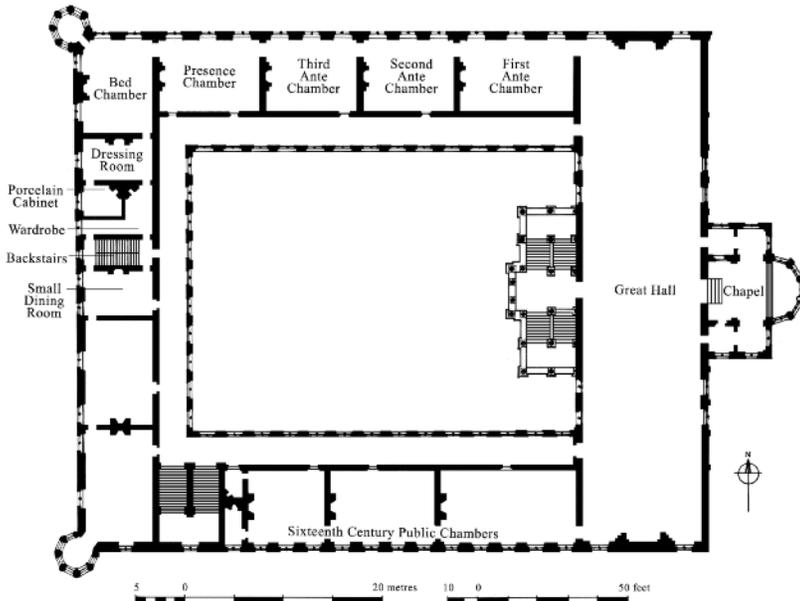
First floor plan of the Palace of Breda showing the layout of William III's public reception rooms after 1685. *Drawing, Melissa Beasley.
